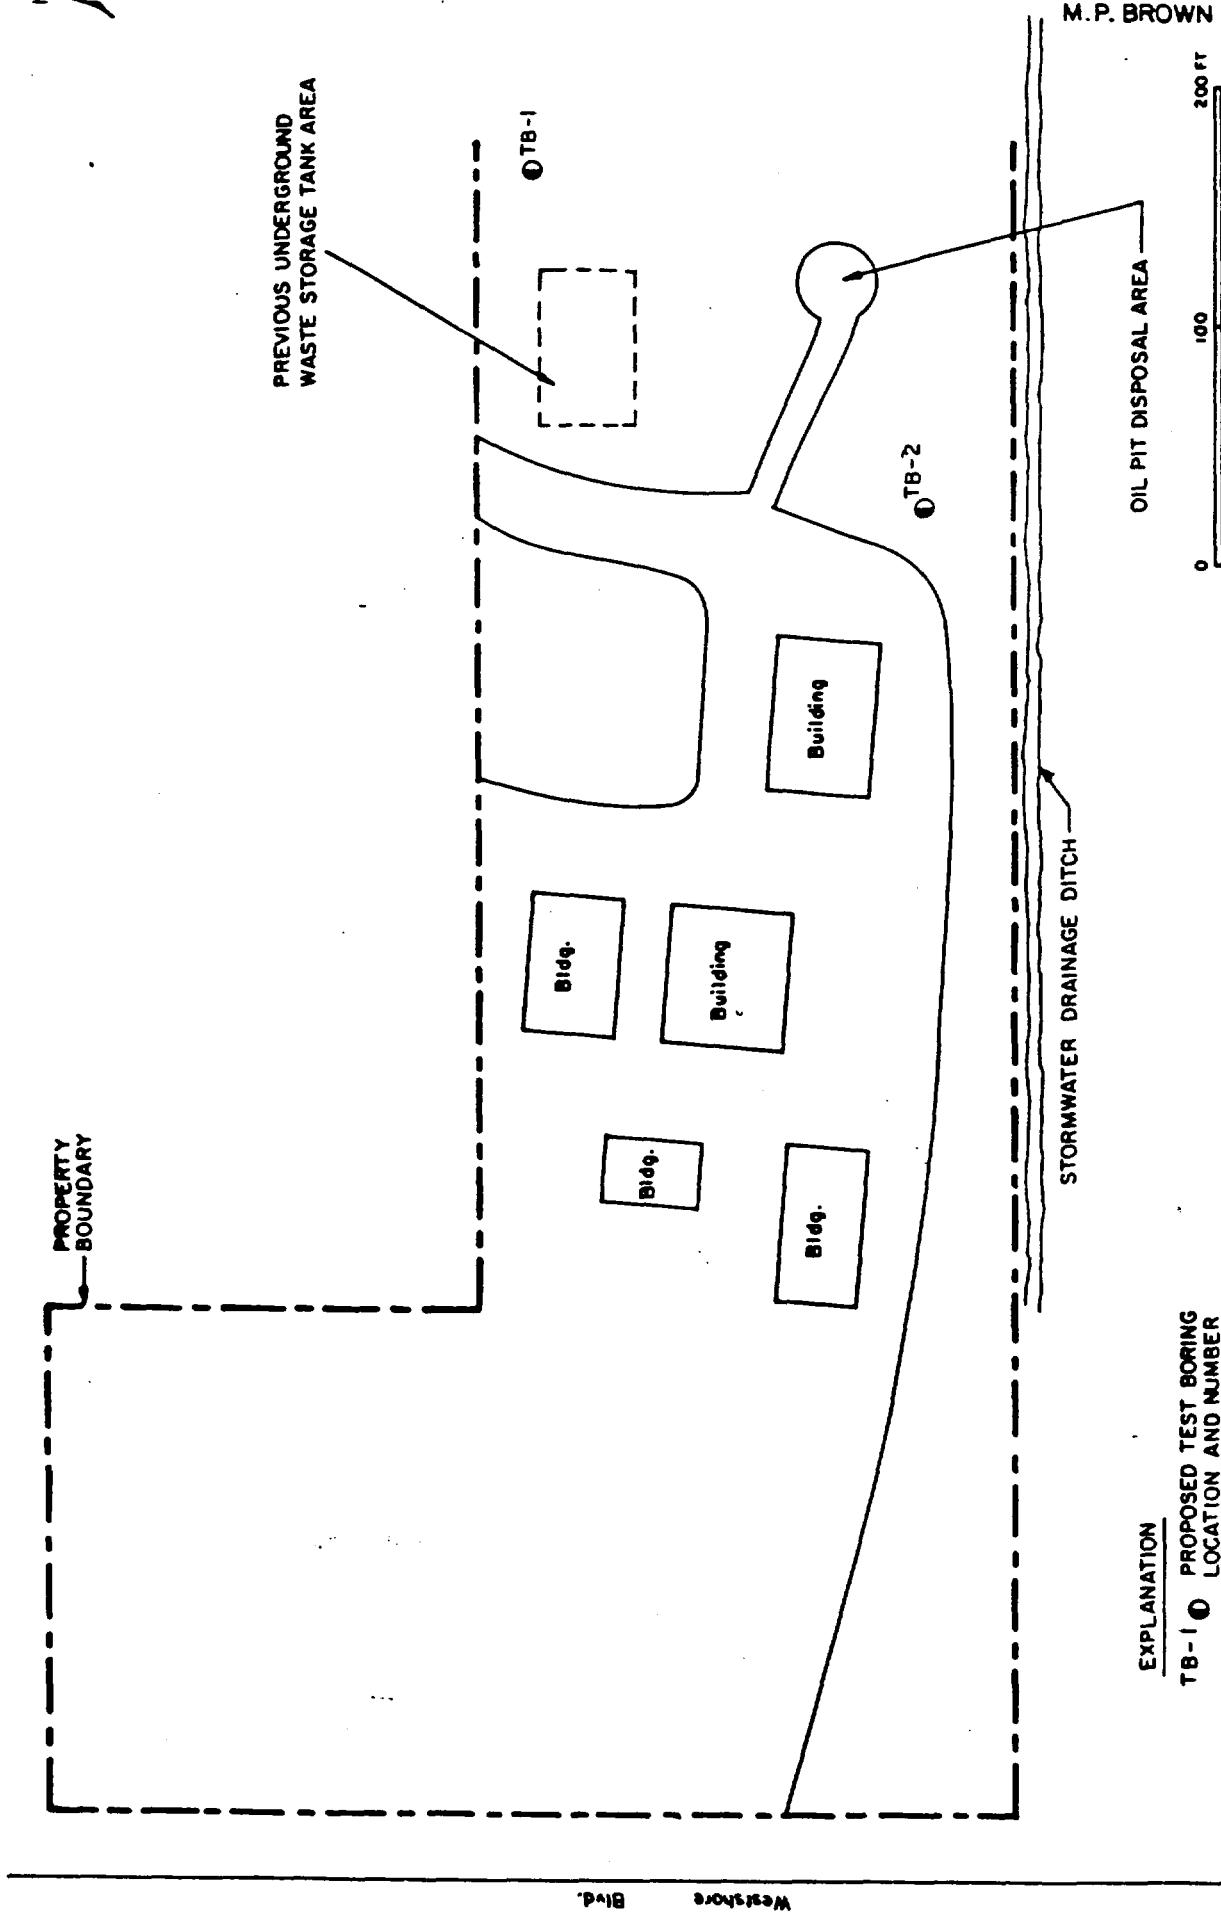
Proposed Locations of Test Borings, Roto-Rooter Drain and Sewer Service, Hillsborough County, Florida
